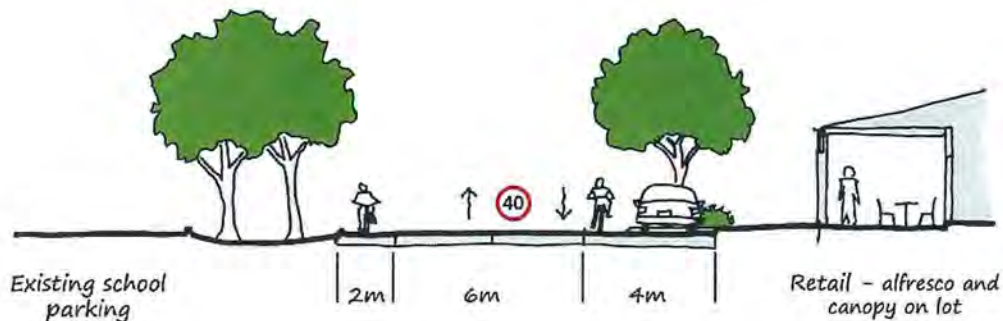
Possible Marmion Street Section Sketch Strategy (showing half reserve).
